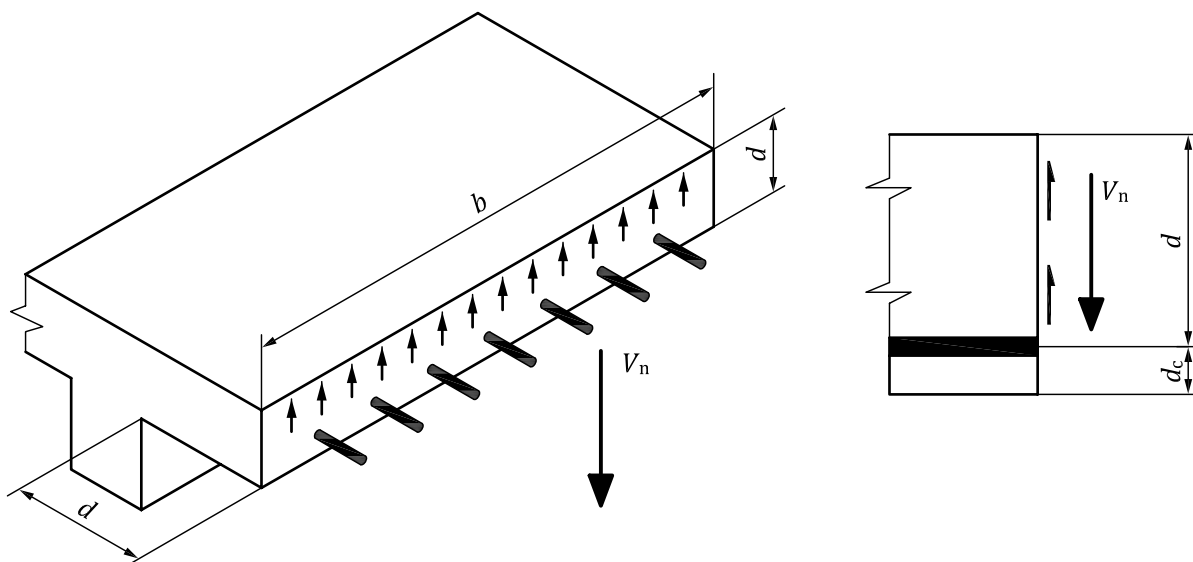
Contribution of concrete to beam-action shear strength in solid slabs
